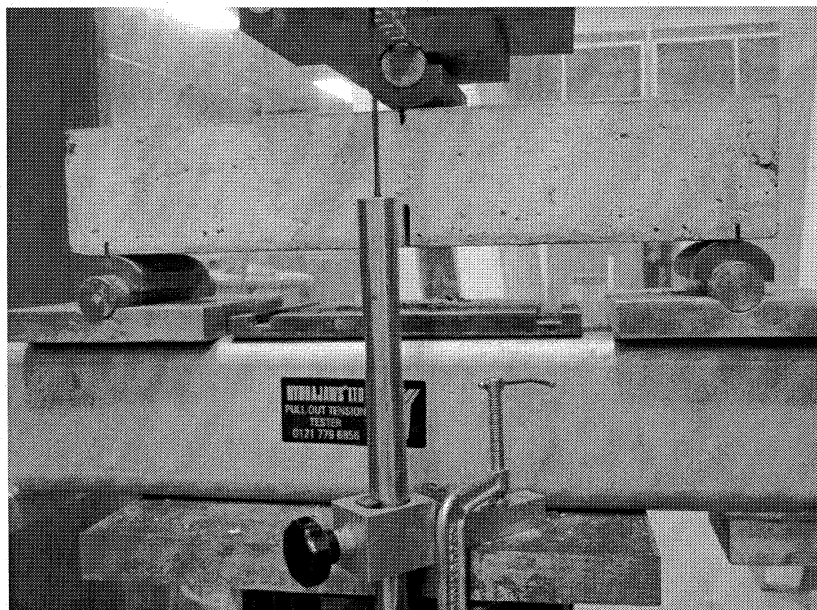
Test set-up and specimens under three-point loading for fracture
